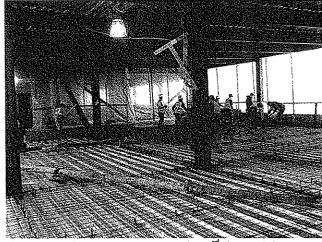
Placing concrete on the 3<sup>rd</sup> floor of the Classroom Wing. December 30, 2011.
